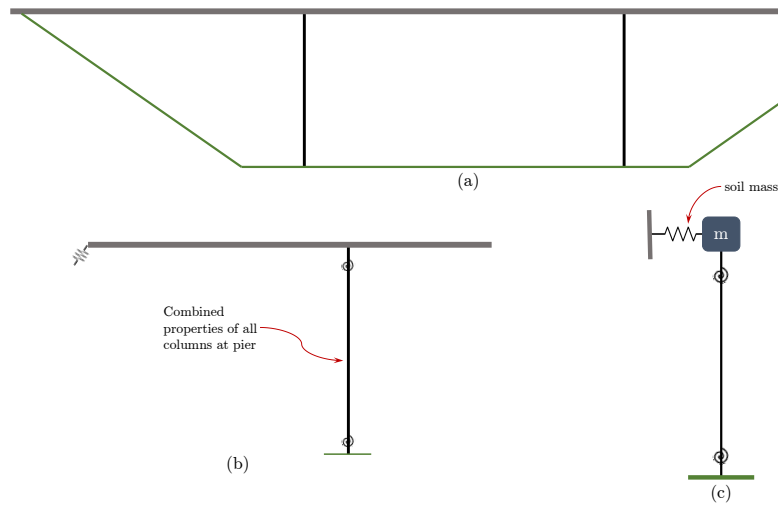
(a) idealization of Bridge 7, (b) reduction to essential sections, and (c) model
